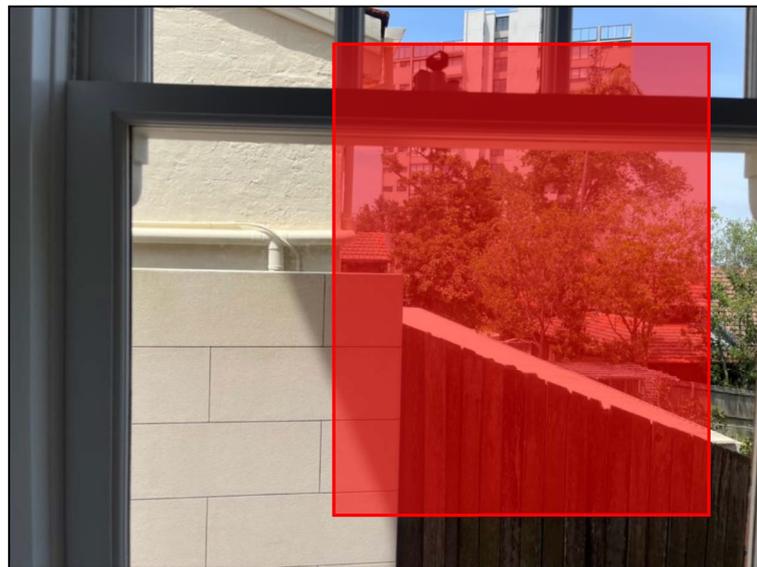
Likely impact on outlook from dining room window – red hatching indicates location of lift
